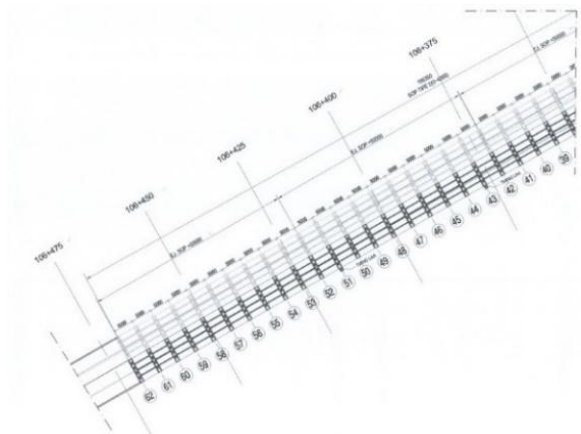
P62 Piling Plan (STA KM.106+475 to KM.106+375)
